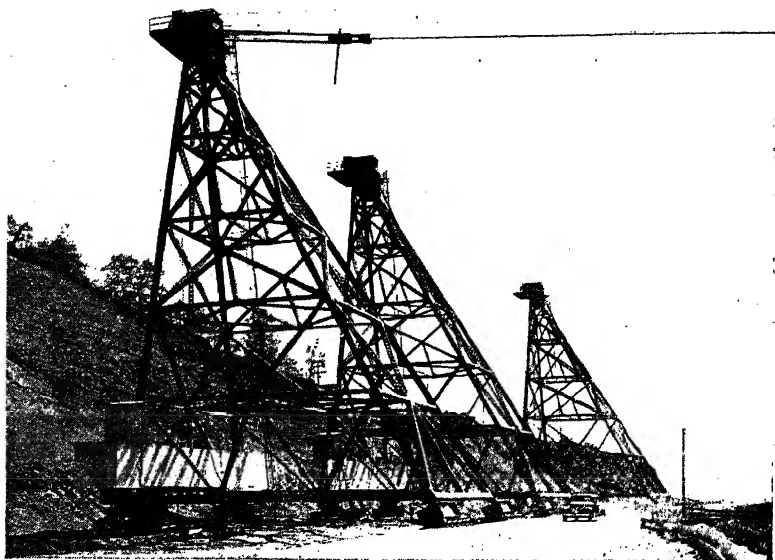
Tail towers for cableway at Shasta Dam. (Courtesy of U.S. Department of the Interior.)
